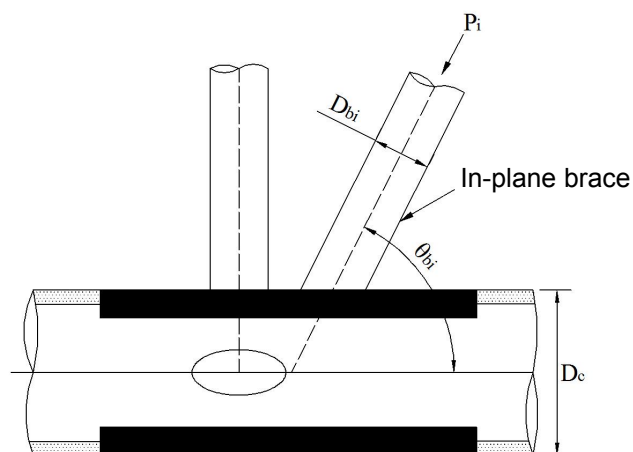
(1) Typical Side View of an In-plane Brace
